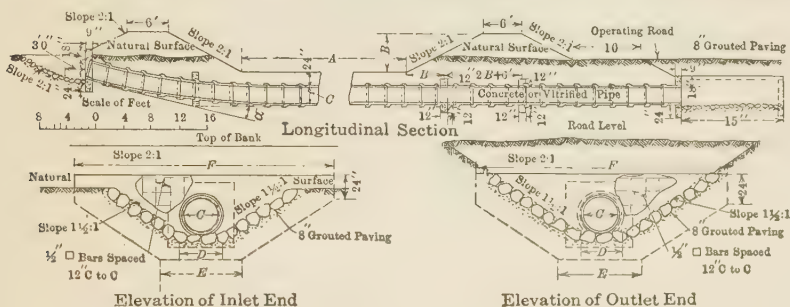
Pipe drainage culvert under Dodson North Canal. Milk River Project, Mont.
